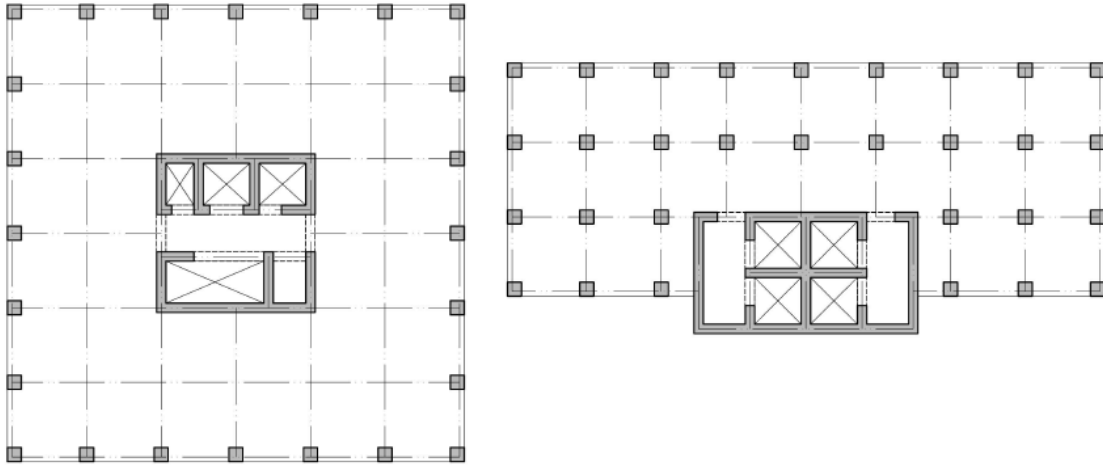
Examples of floor plans with core walls (image reference: [1])
